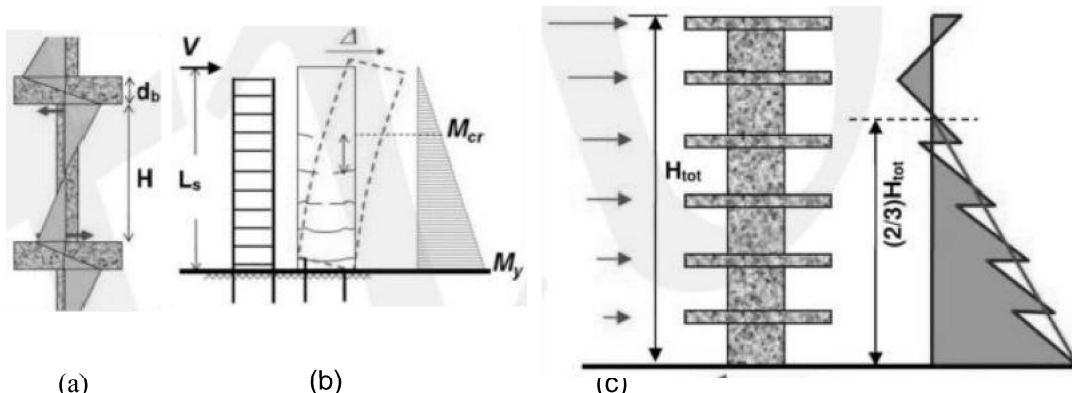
(a) Static model used for beam-column elements undergoing lateral sway. (b) The cantilever part to the right has the same moment distribution as the swaying column over the length from the point of contra-flexure to the face of the support. Owing to this similarity the cantilever member is used to illustrate the concept of shear span, $L=H/2$, and the relationship between shear demand and flexural moment strength: $V=M/L$. (c) Static model for structural walls. The straight line defines an "equivalent" linear moment diagram to relate shear demand with moment strength: $V=M/(2H/3)$
